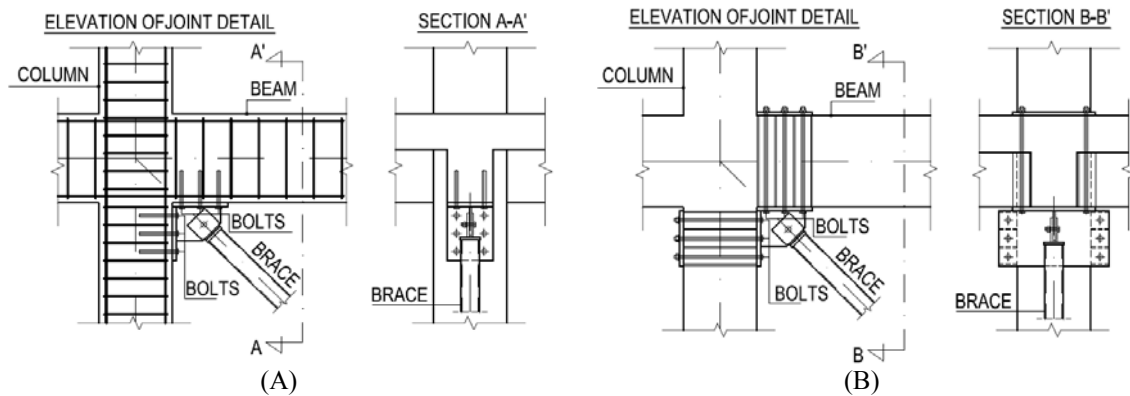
Details of the structural elements framing into a joint. Two alternative schemes: (A) use of anchored bolts inside the concrete, (B) use of bolts and plates at the two faces of the structural elements
